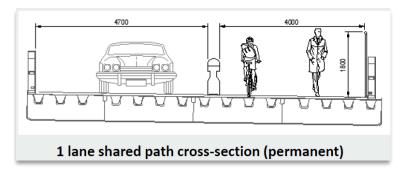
Schematic 'Option 3' cross section, 4.7m lane width maximum.
